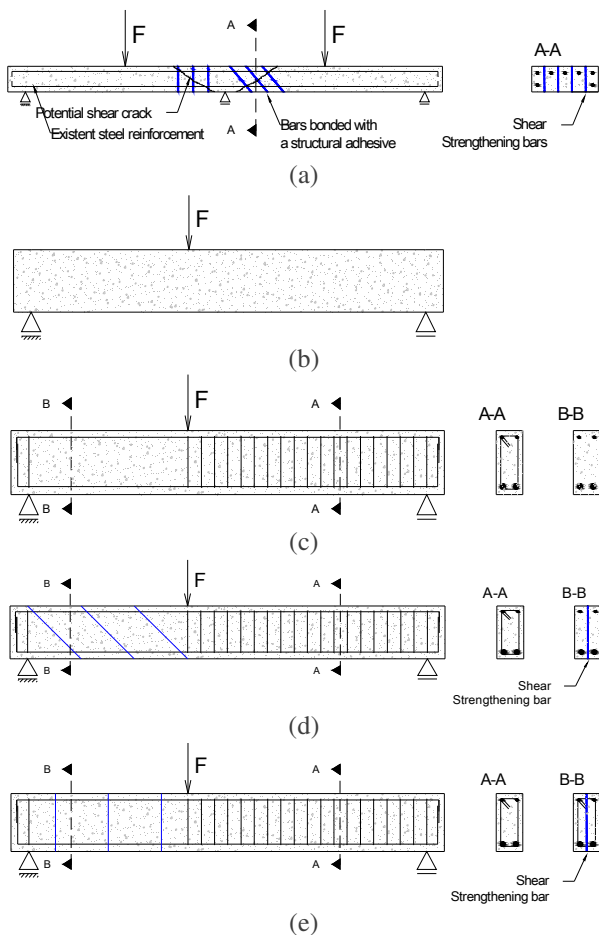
(a) Concept of the Embedded Through-Section (ETS) technique, (b) Typical specimen, (c) Reference beam and strengthening bars with the desired inclinations: (d) 45° and (e) 90°.
